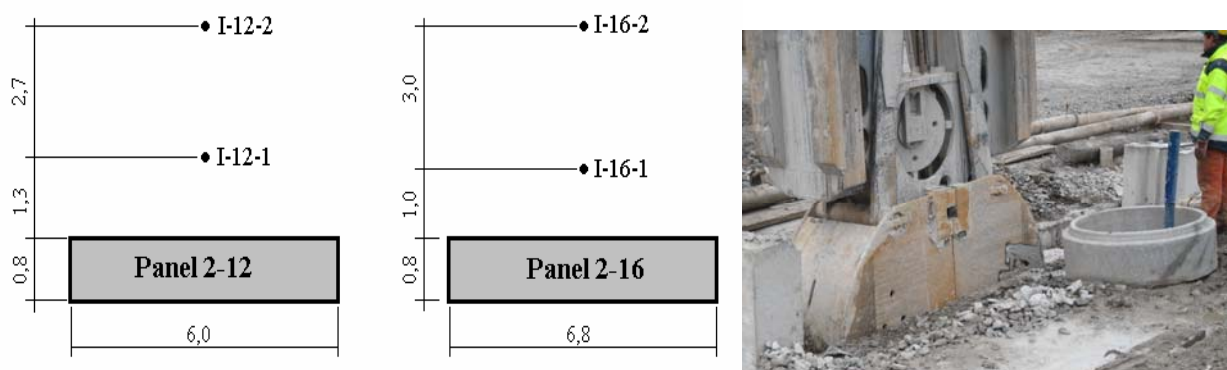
Plan of inclinometers installed behind panel 2-12 and 2-16 and “on site” conditions
